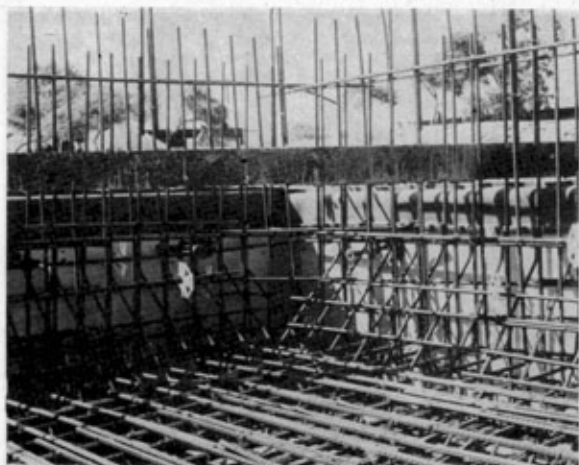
Detail of steel and fixing systems in a corner bay shown before fixing fillet formwork in front. The water-bar is nailed to the rear formwork.
